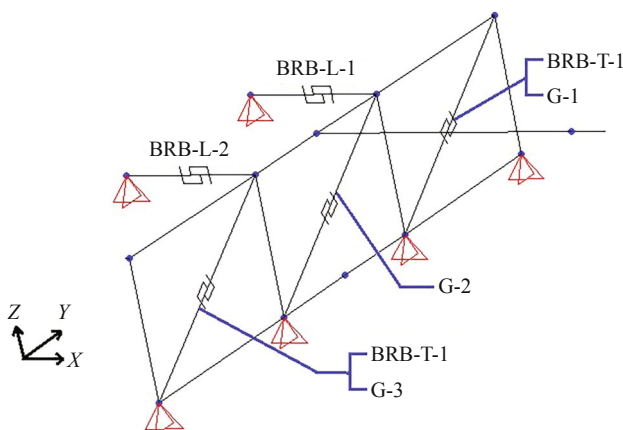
EDS-1 with two longitudinal BRBs on top of Abutment-1 in the new multi-span bridge model
